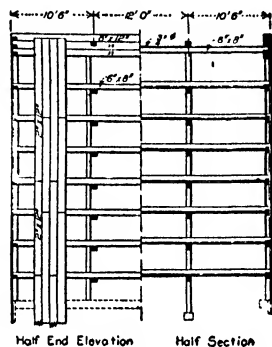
Framing of Cofferdam, Municipal Bridge.
